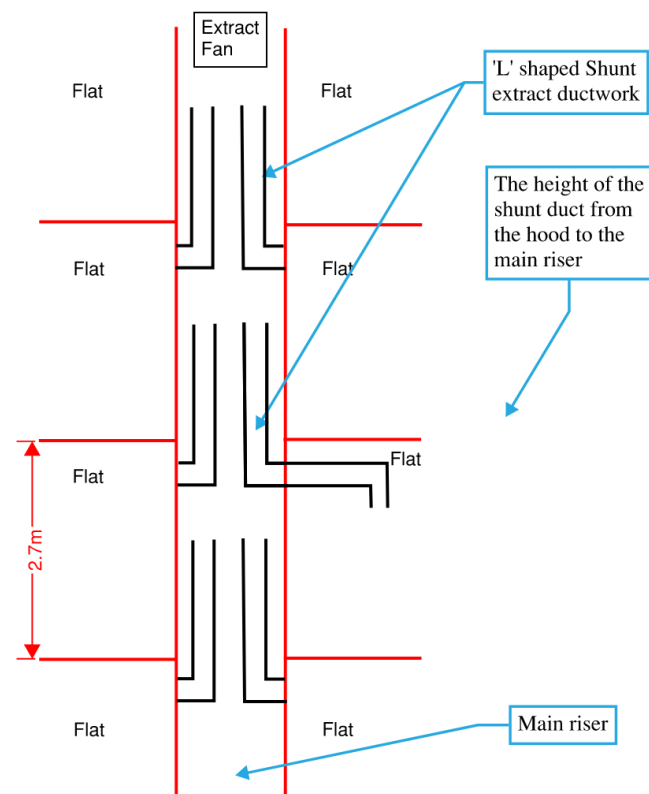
Existing layout of shunt duct system in Cromwell Tower
